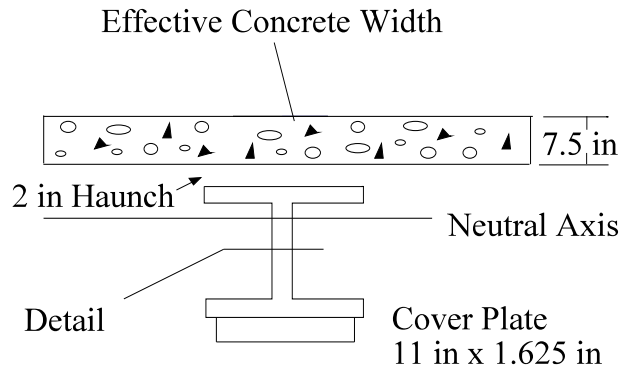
Composite Concrete Bridge Deck, Detail No. 2
